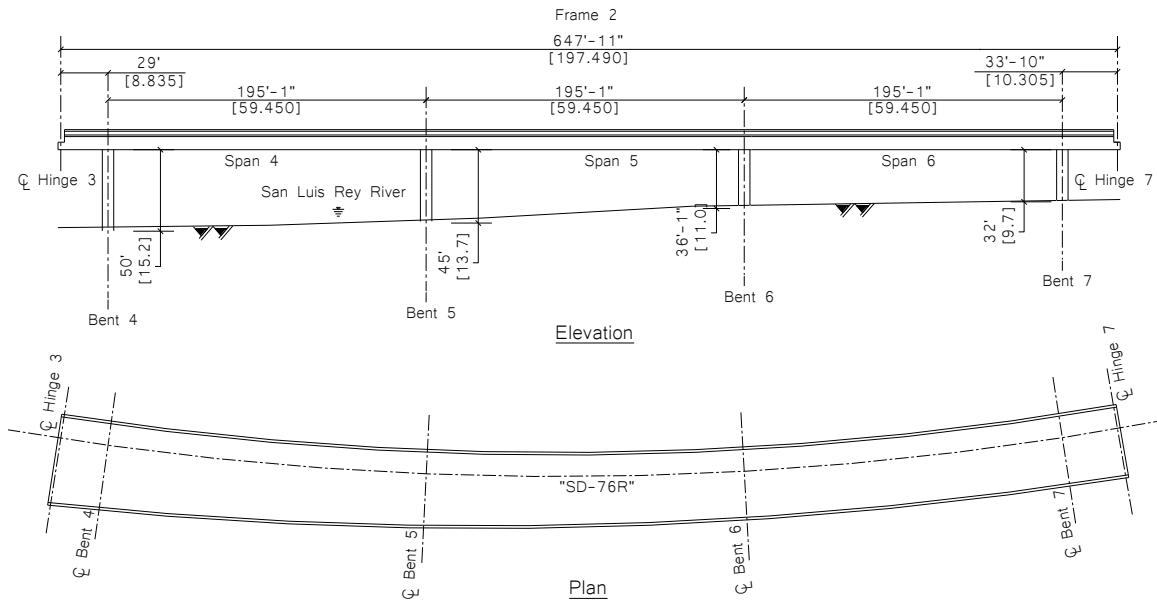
Elevation and plan of Frame 2, Bridge 1
